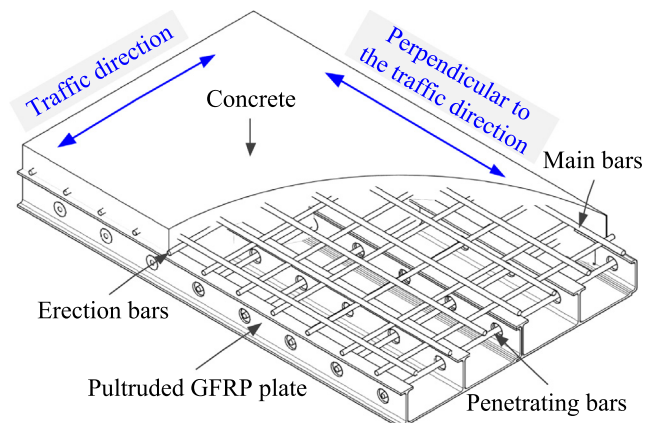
Hybrid GFRP-concrete bridge deck structure.
